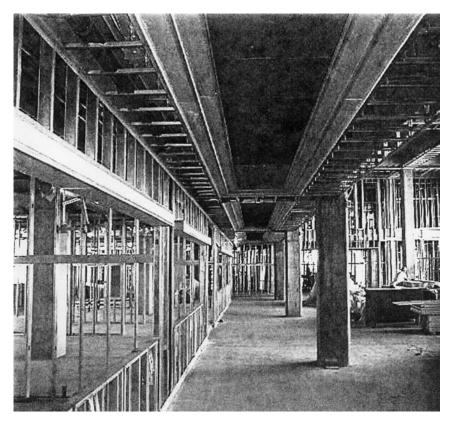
Concurrent drywall and integrated ceiling installation.
